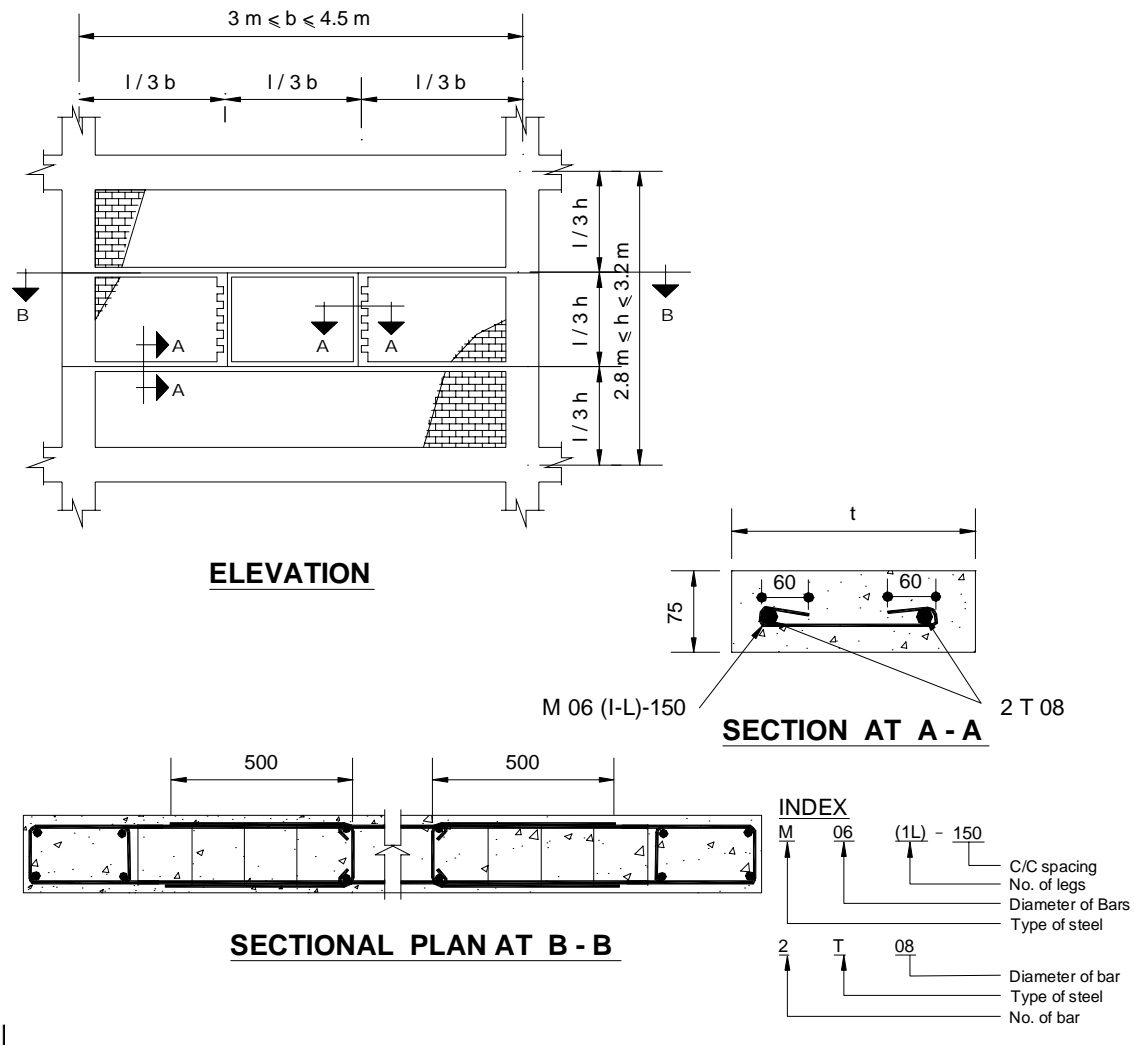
Details for Opening Stiffening of Infill Wall
